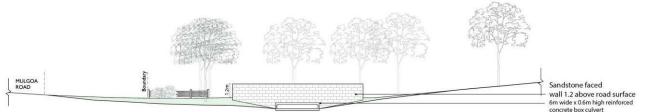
Eastern Precinct Residential Entrance Elevation A-A
